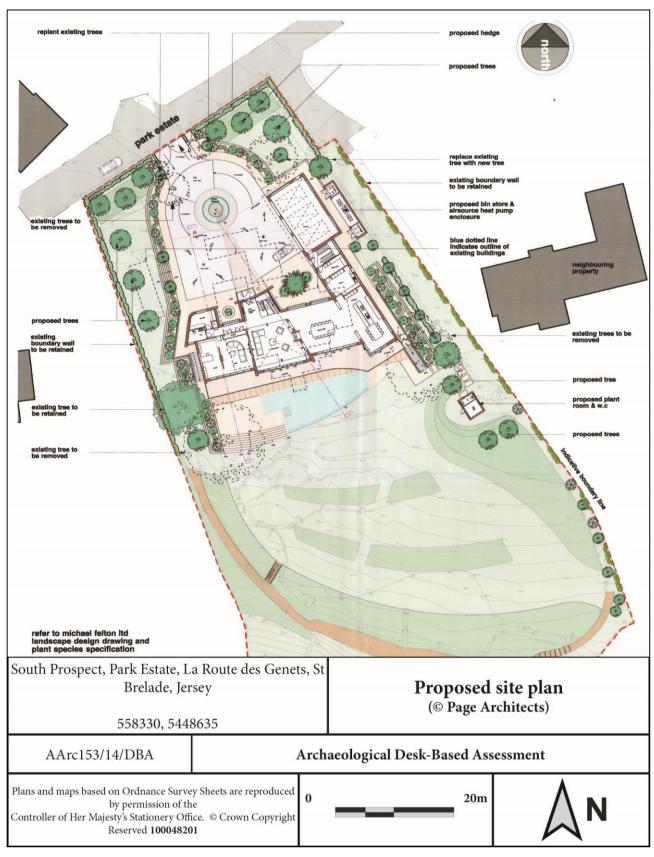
Proposed site plan showing existing buildings (hashed in blue) @ Page Architects
